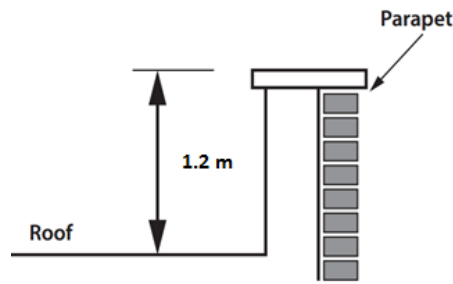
Roof parapet wall (OSHA, 2010).
